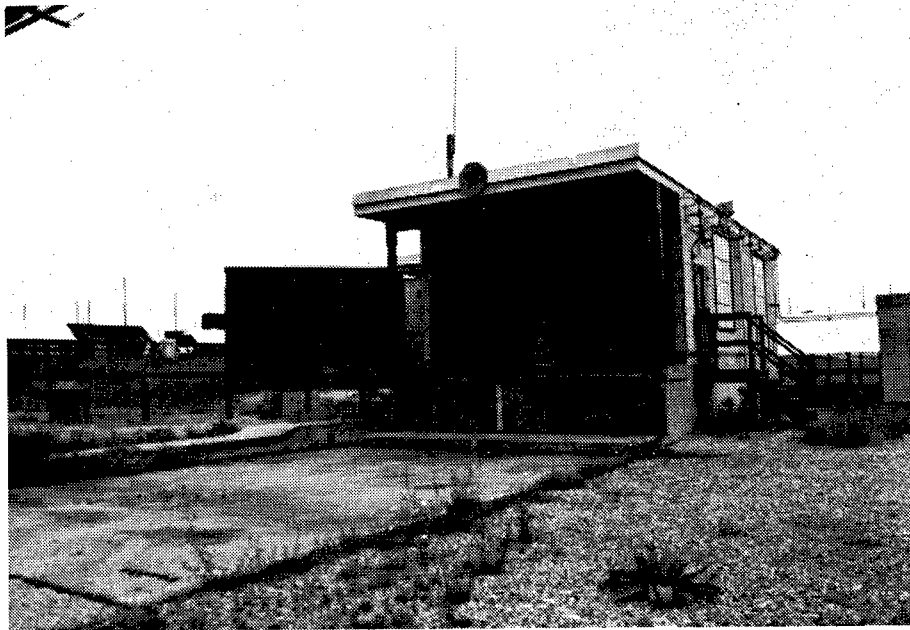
Building K10: Explosives Manufacturing Plant, TNT Opening Building.
